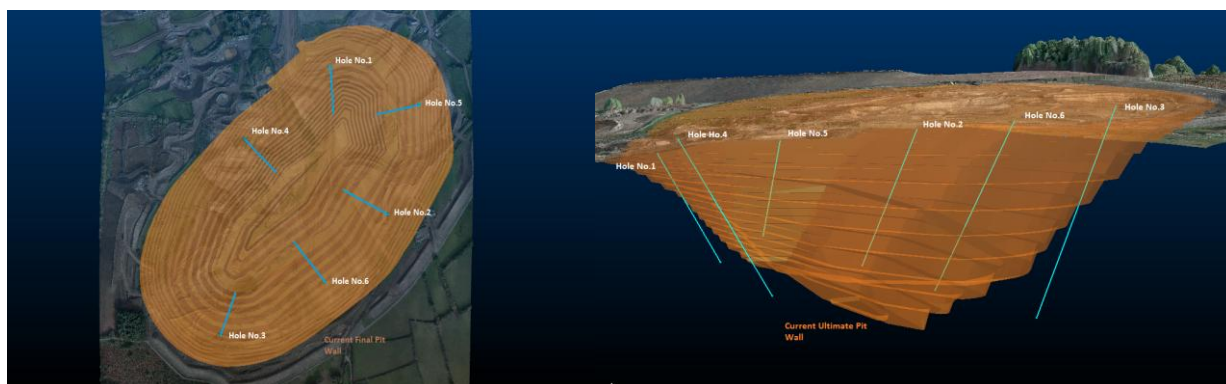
Plan and cross section showing position of geotechnical diamond drill holes around the perimeter of the open pit.
